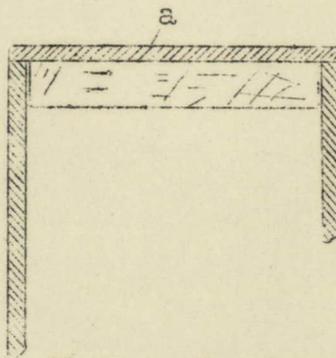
Reinforcing the flange of a box girder with thin plywood.
